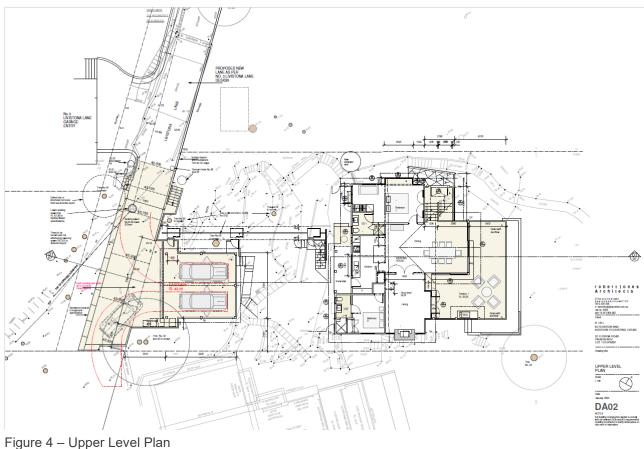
Upper Level Plan Source: Robert Jones Architects, January 2021
